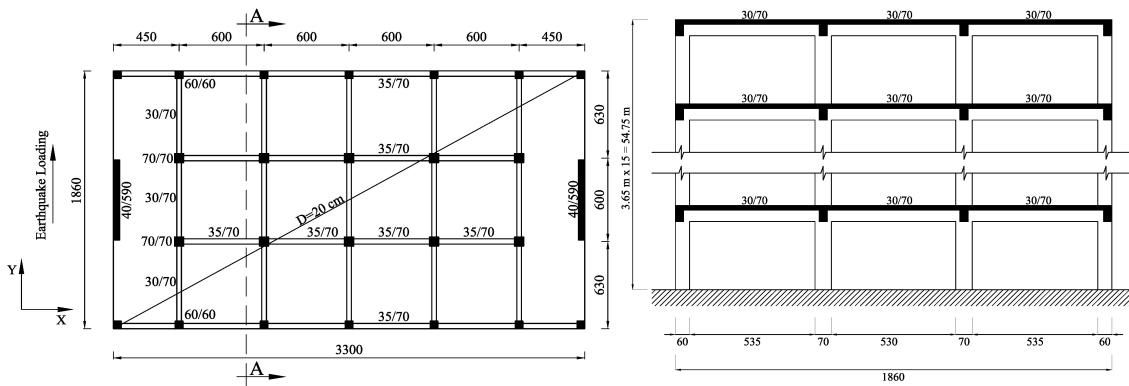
Plan and section A-A of the studied 15-storey RC building ( $\eta = 0.8$ )
